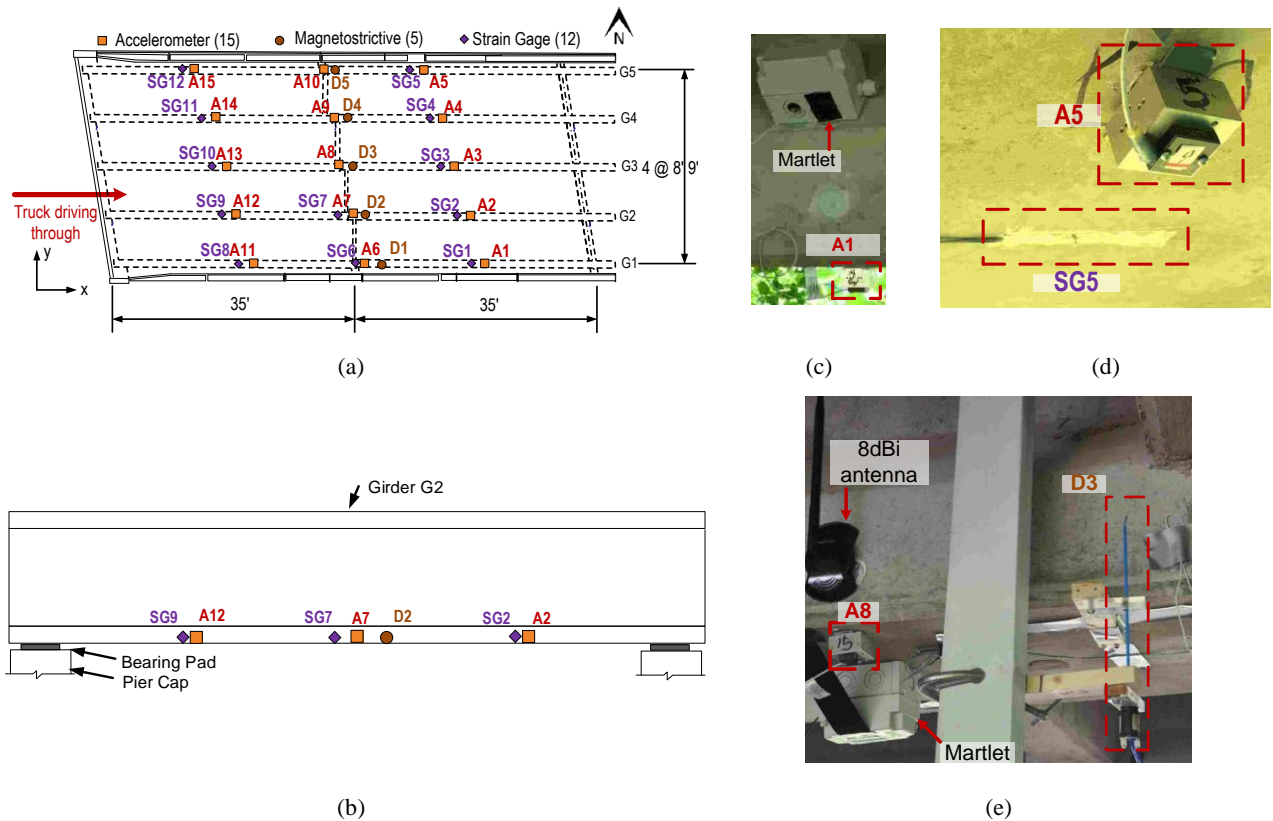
Summary of instrumentation: (a) instrumentation plan; (b) elevation view of girder G2; (c) accelerometer A1; (d) accelerometer A5 and strain gage SG5; (e) displacement sensor D3 and accelerometer A8
